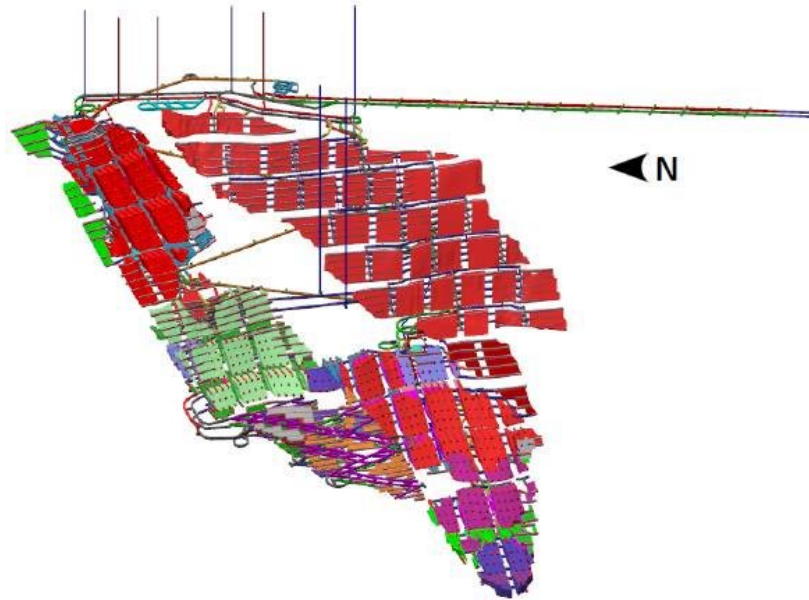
Isometric image of the F-Central Mine Design (not to scale)
